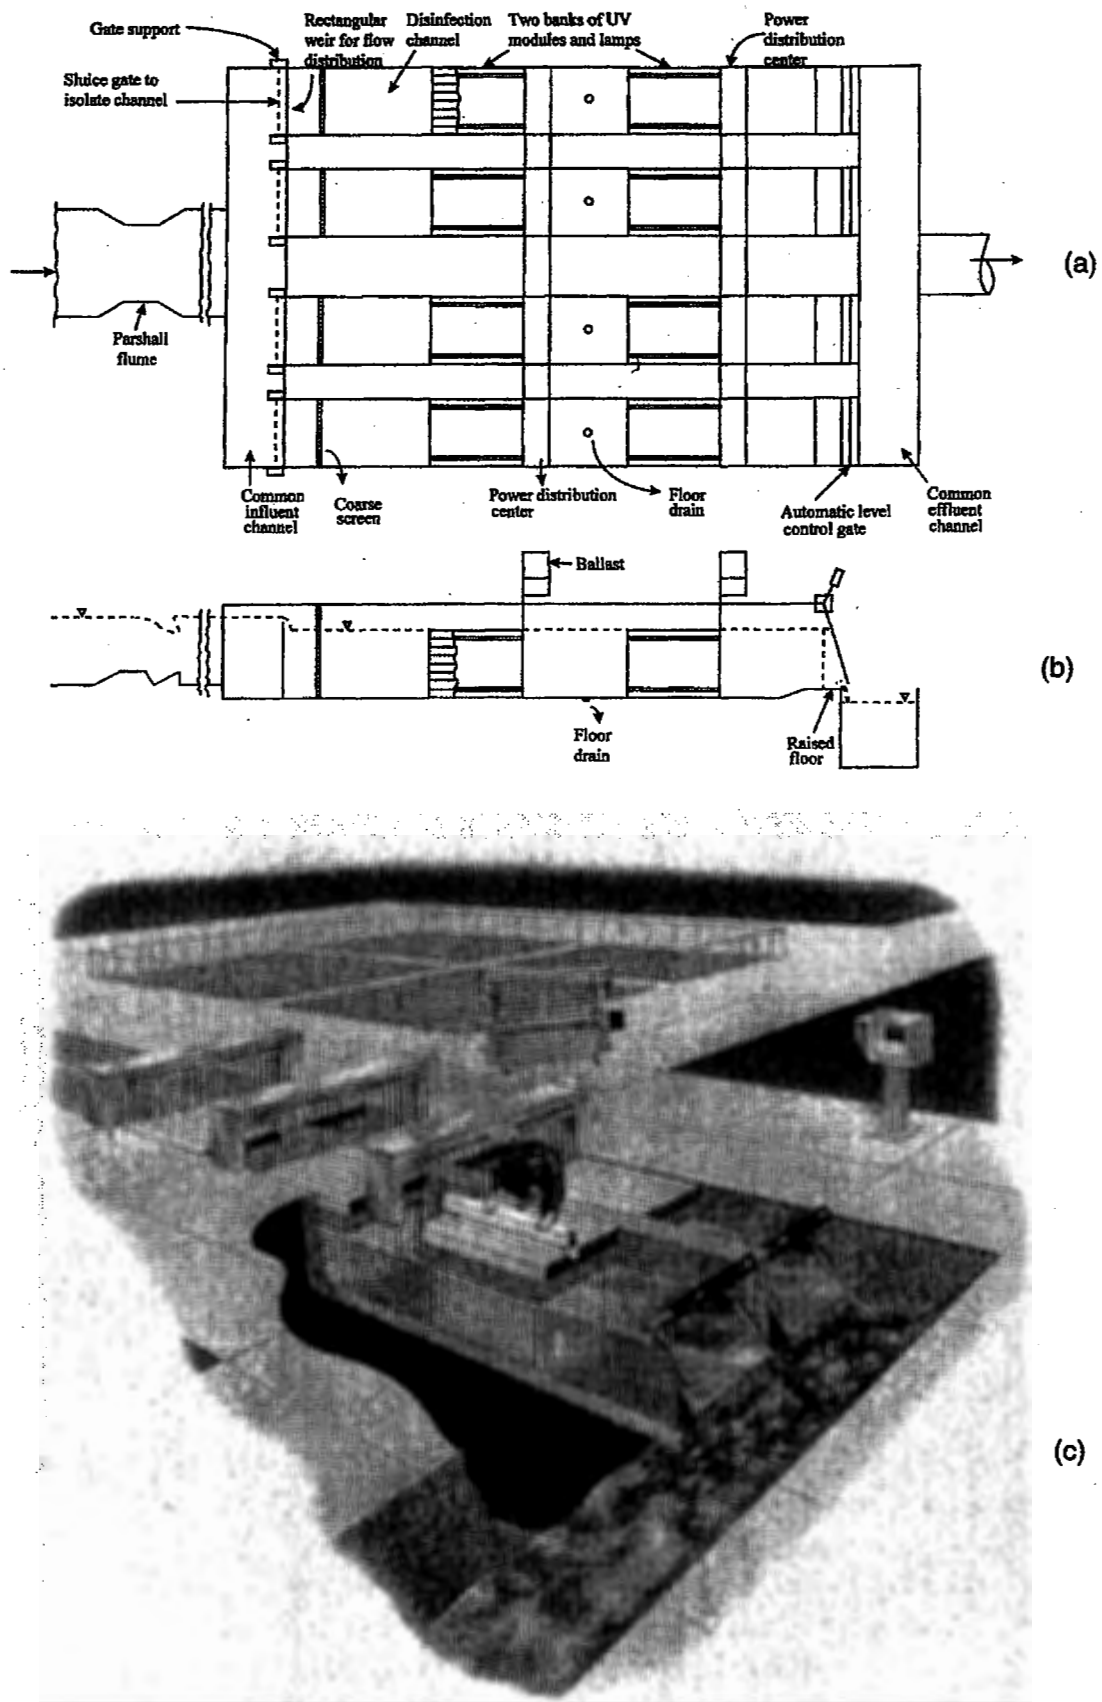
UV Disinfection System Layout: (a) plan view, (b) longitudinal section of proposed facility for the Design Example, and (c) a photograph of UV system with two channels and three banks (courtesy Trojan Technologies, Inc.).
